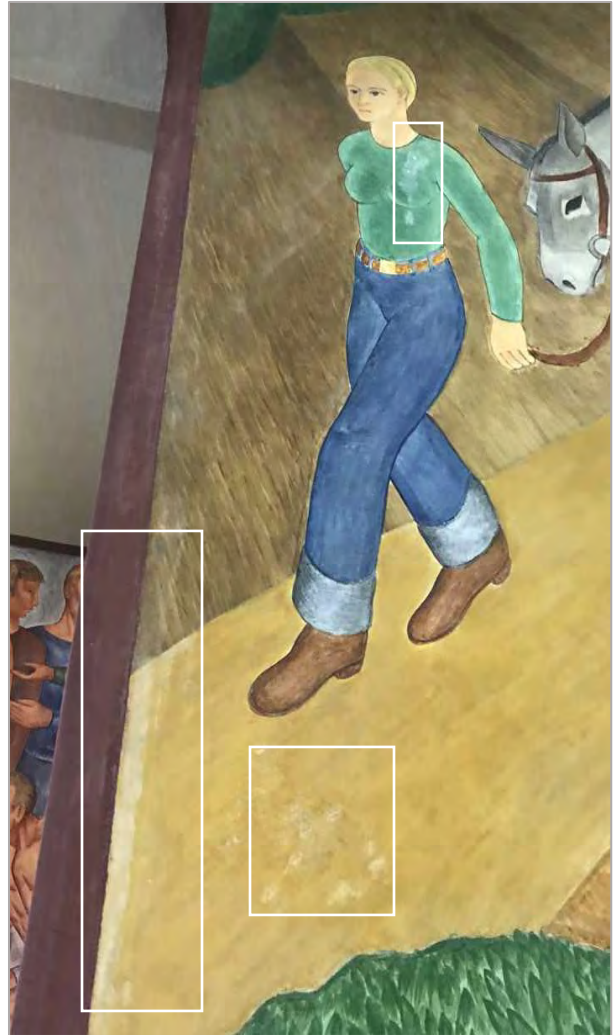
Detail of same location after water damage. Image shows areas with efflorescence.
